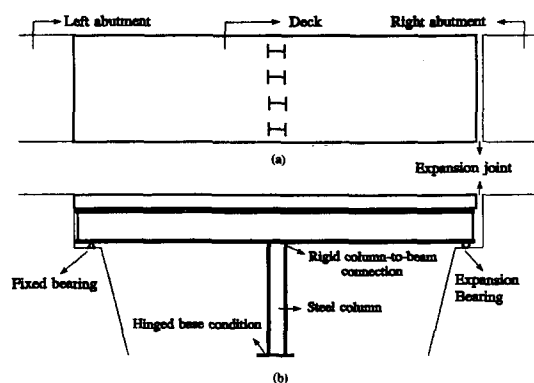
Typical Single-Span Simply Supported Bridge: (a) Plan View; (b) Side View
